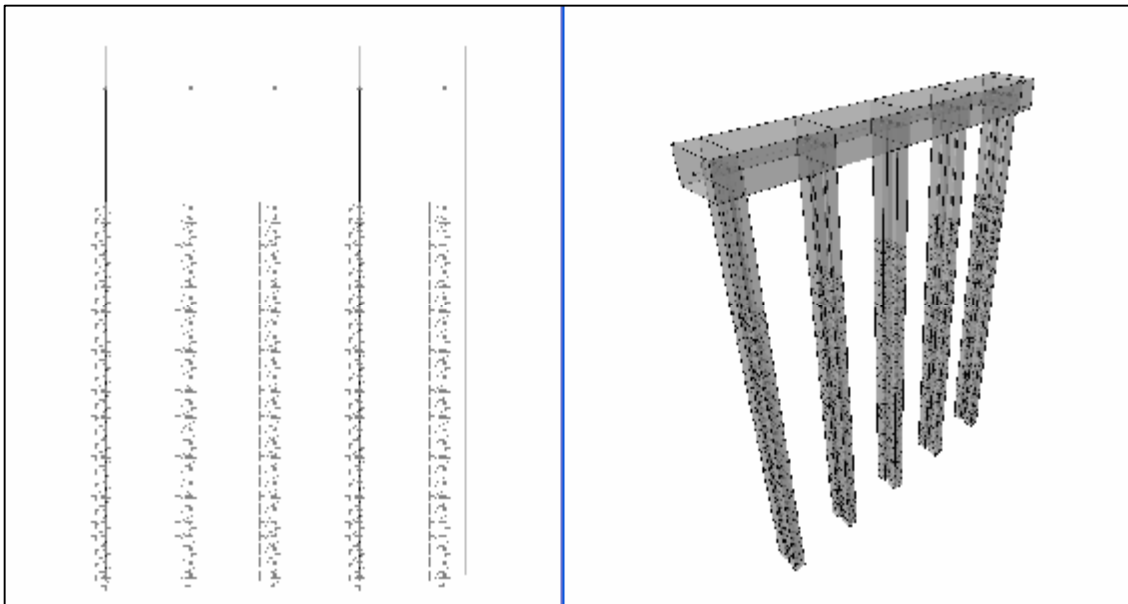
SAP Model--Washington County Bridge, Two Rows of Piles
